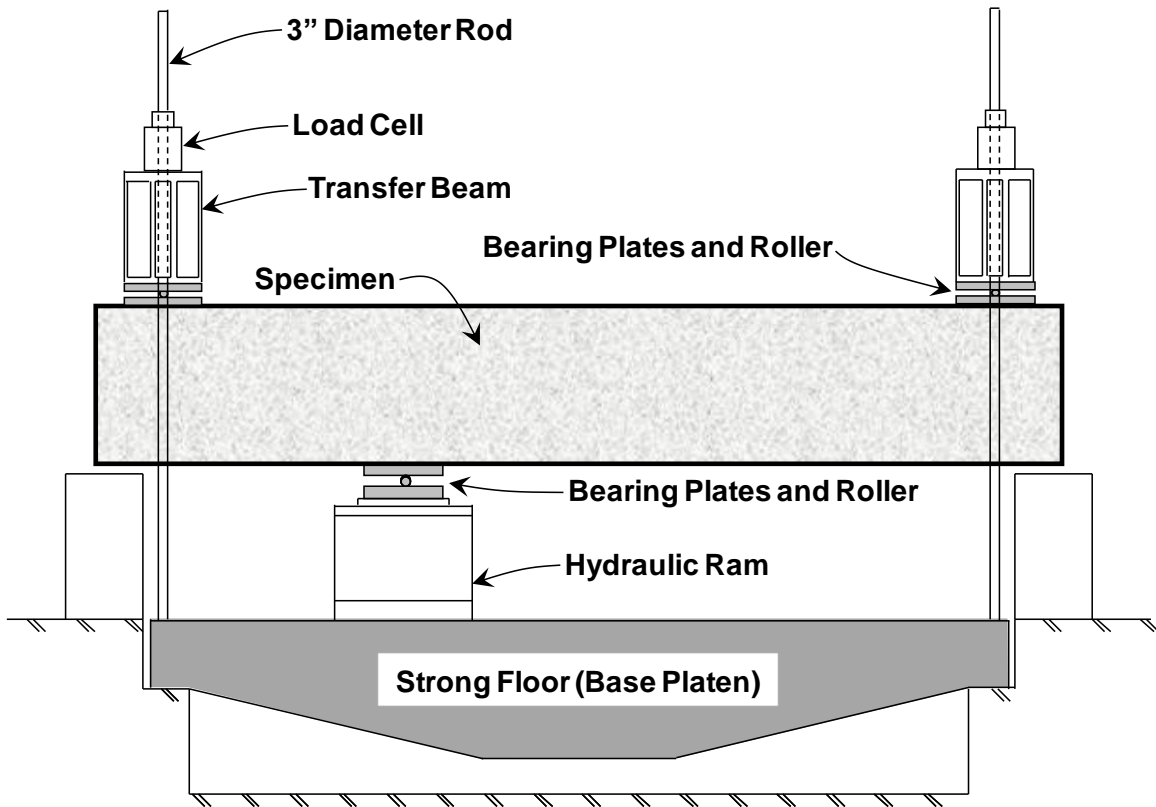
Elevation view of test setup for TxDOT Project 0-5253 (from Birrcher et al., 2009)
